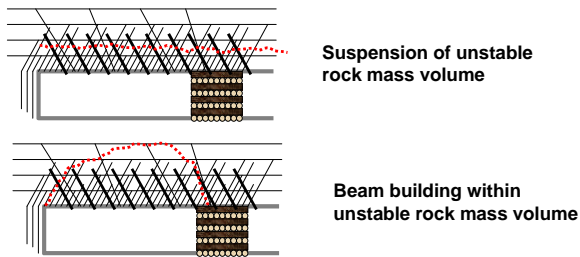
Rockbolt suspension and beam building for supporting the stope face.
